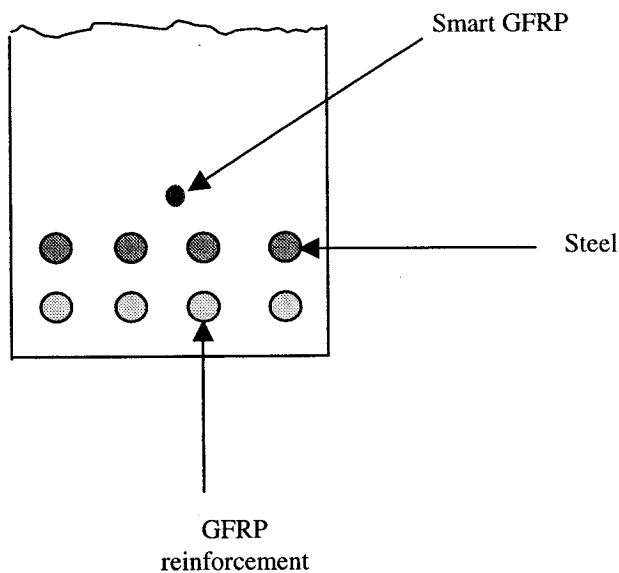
Concrete beam reinforced with GFRP rods and steel and instrumented with a pultruded smart GFRP rod with an embedded Bragg Grating sensor
